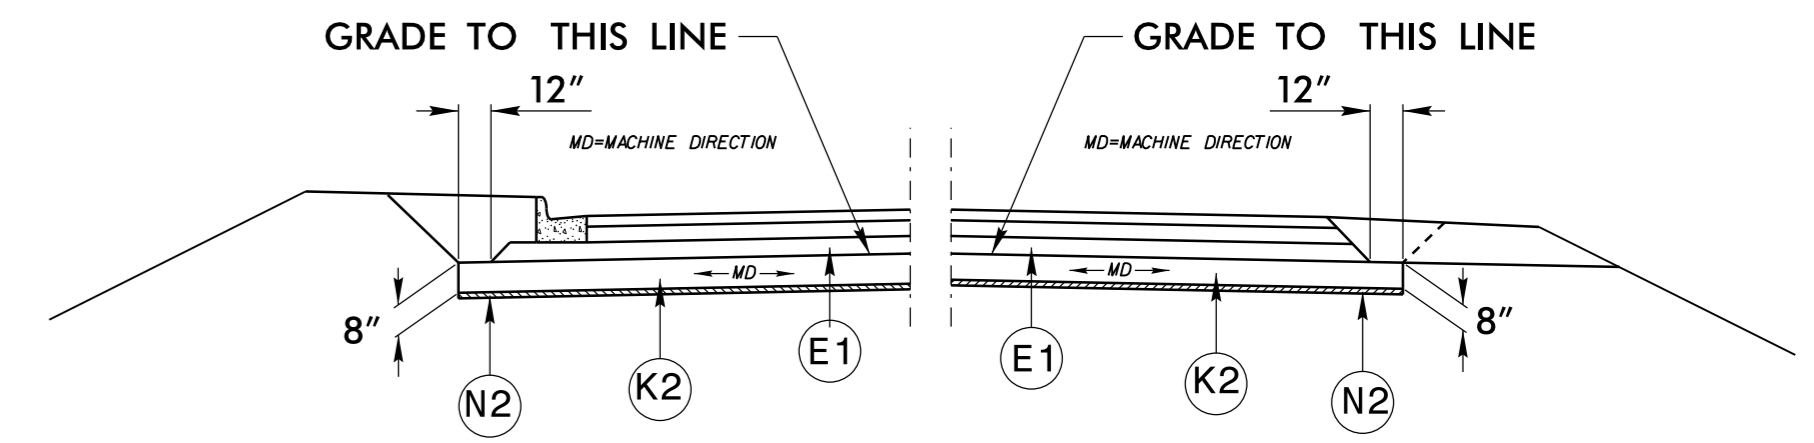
DETAIL FOR CHEMICAL STABILIZATION GEOTEXTILE FOR PAVEMENT STABILIZATION WITH ABC
